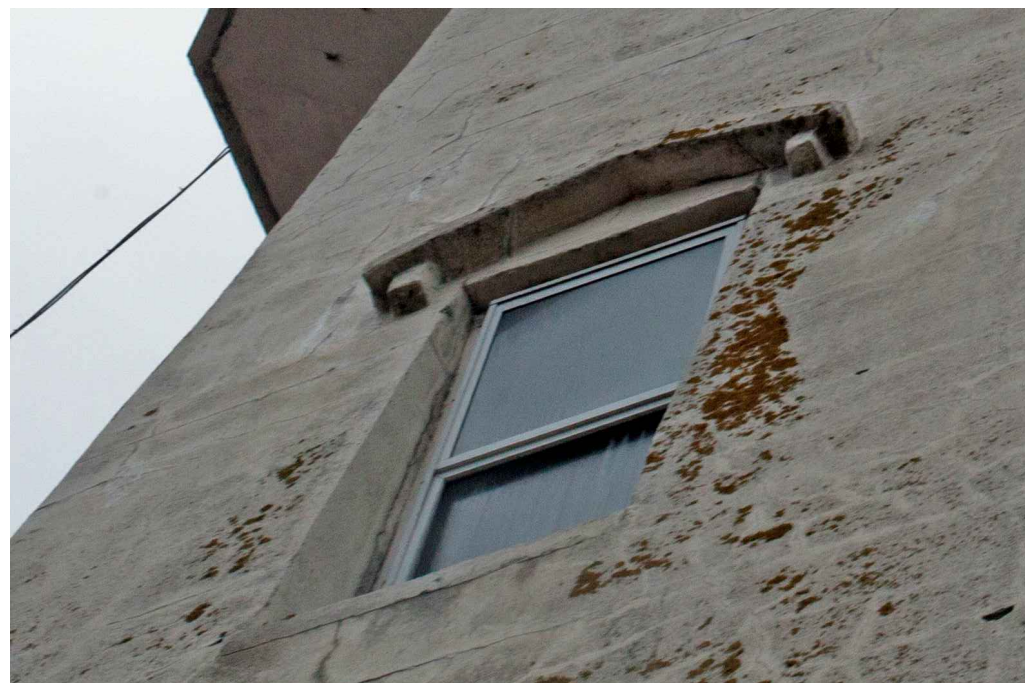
TYPICAL CONCRETE PEDIMENTS AT WINDOWS W13, W14, W15 & W16 TO BE REPAIRED IN PLACE. NEW CONCRETE PEDIMENTS AT WINDOWS W17 & W18. REFER TO STRUCTURAL.
